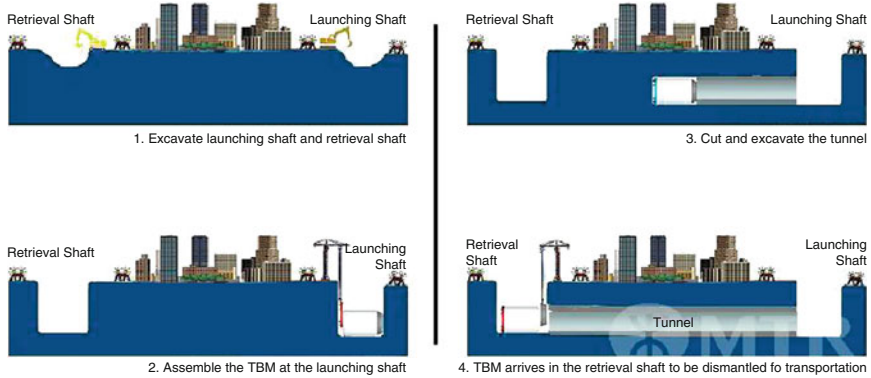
Various stages of excavation using TBM (Ref: <http://www.expressrailink.hk/en/construction/construction-methods.html>)
